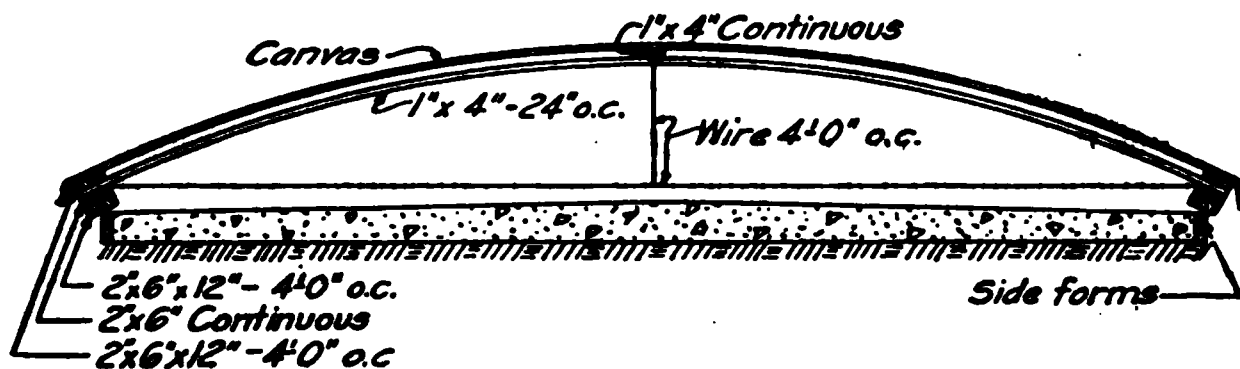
Cross section showing construction of frames and methods of supporting them on side forms.
